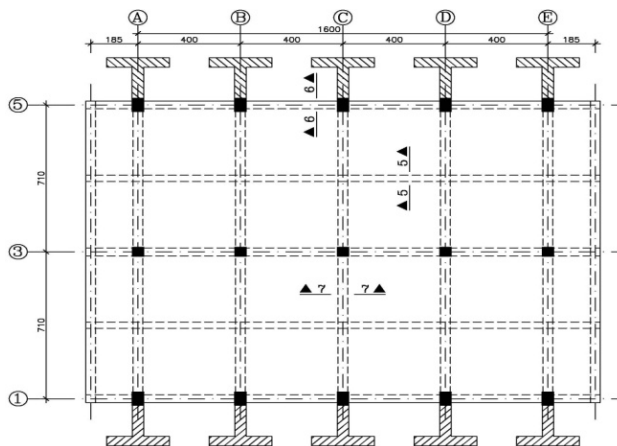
Retrofitting plan at half floor ceiling Figure 8. Concrete shear wall connected to the column
